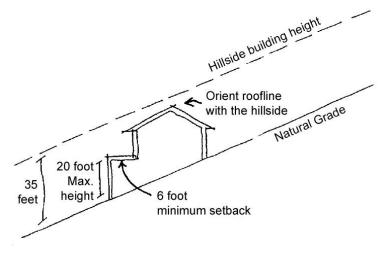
E.2.c Downhill Building Step Back
